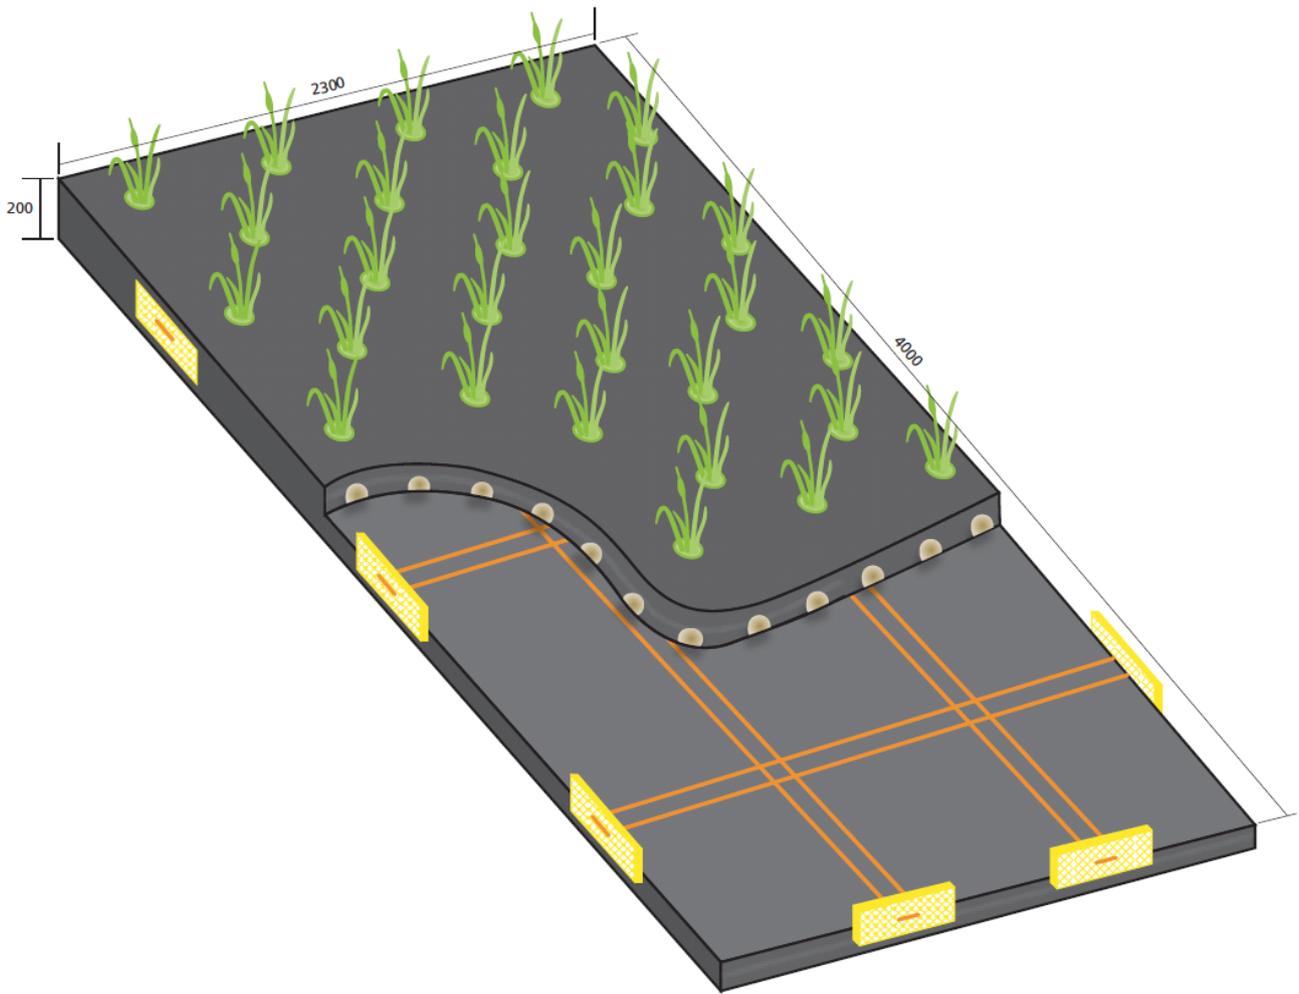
Typical Module layout showing cutaway section of PU foam and Nylon webbing connecting between Aluminum Joiner Plates
